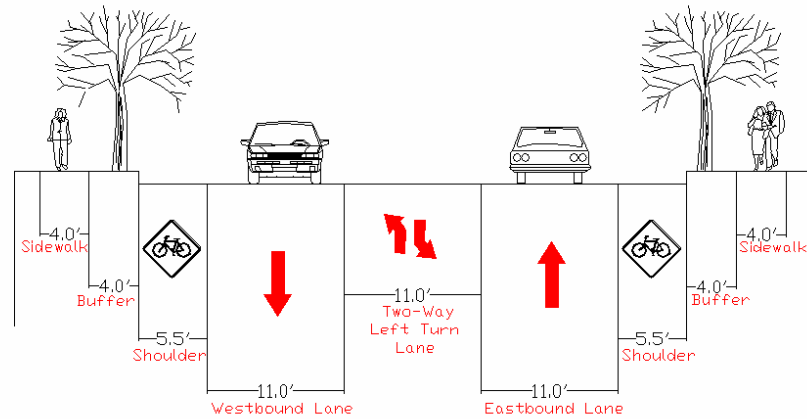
Proposed Cross-Section Upper Raritan Avenue
